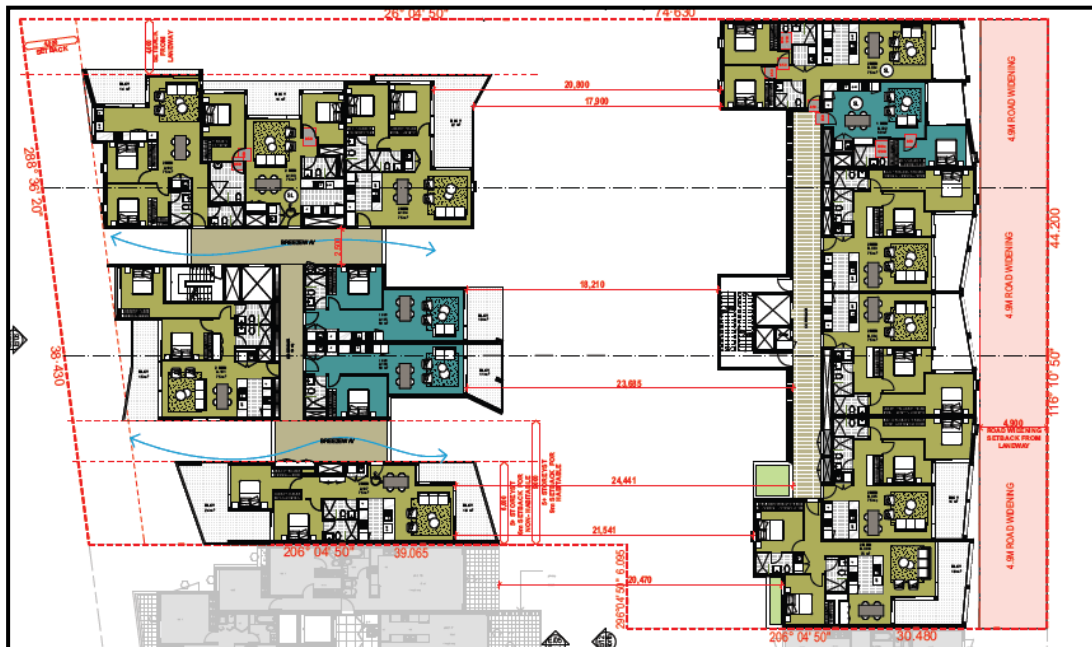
Extract of the architectural plans showing the floor plan for levels 1 – 4
